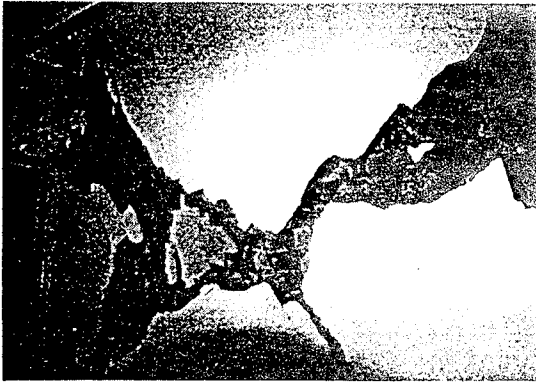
Damage of brick wall of the high-rise residential building (Fengyuan City, Taichung County)
